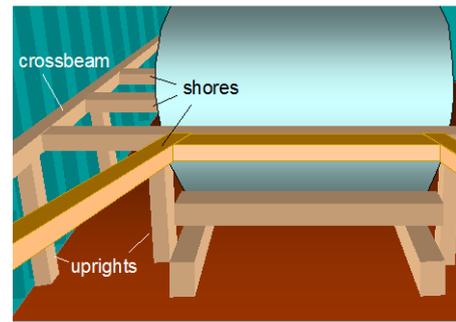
Shoring arrangement with uprights and crossbeam
